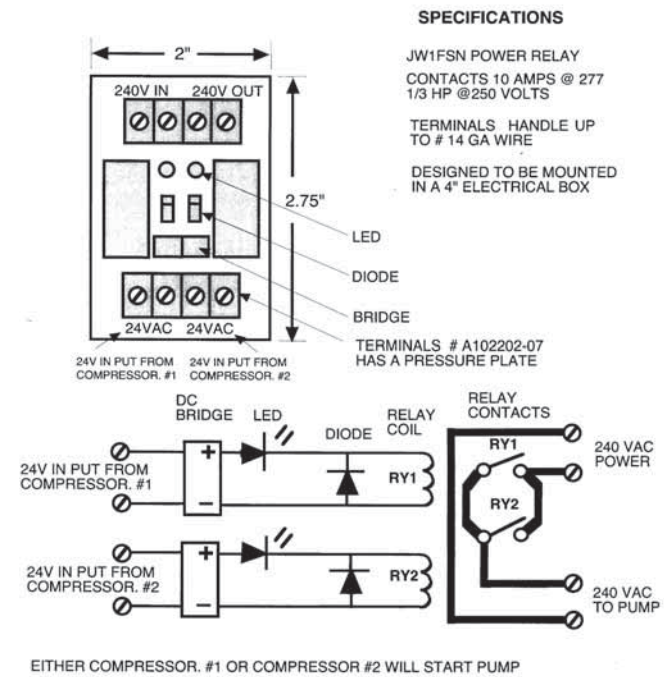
Heat Pump / Circulator Pump Power Wiring
